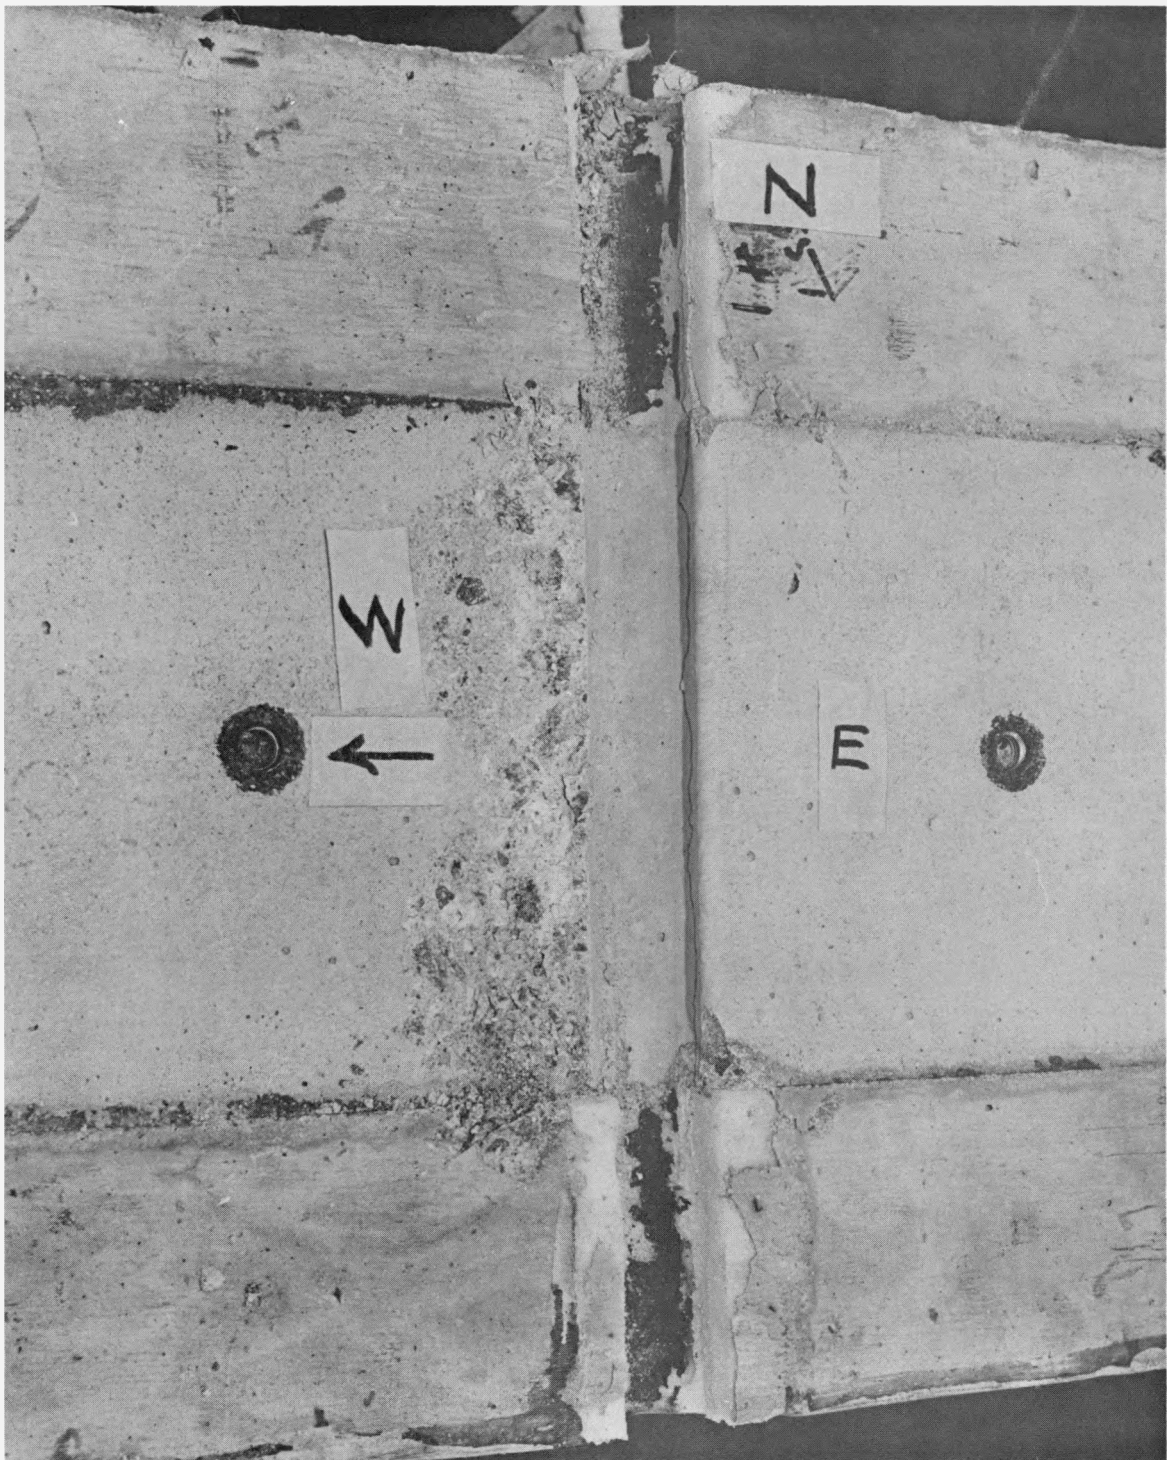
Concrete damage after monotonic test, specimen 3 (1-in. Schedule 40)
